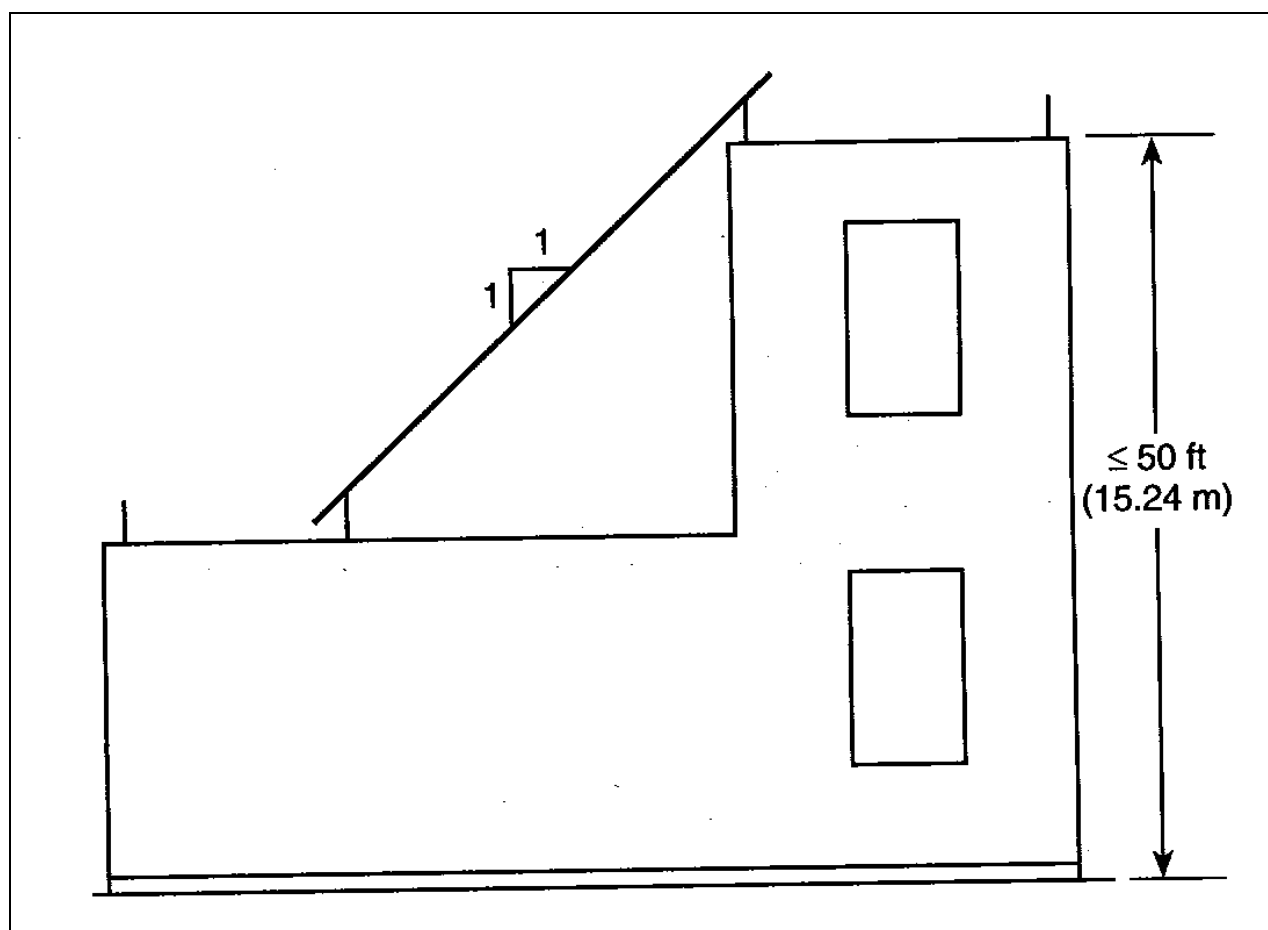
Lower roof protection for flat roof 50-feet or less high
